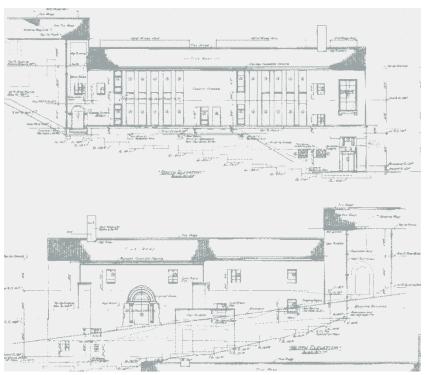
Elevations showing north and south (upper) and north (lower) façades of the Science Building (Woods Hall) Annex Architectural drawing set by W.B. Daniels, 1931
